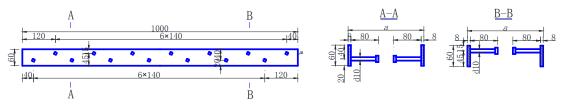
Layout of the PSS connector in a standard deck (Unit: mm)
